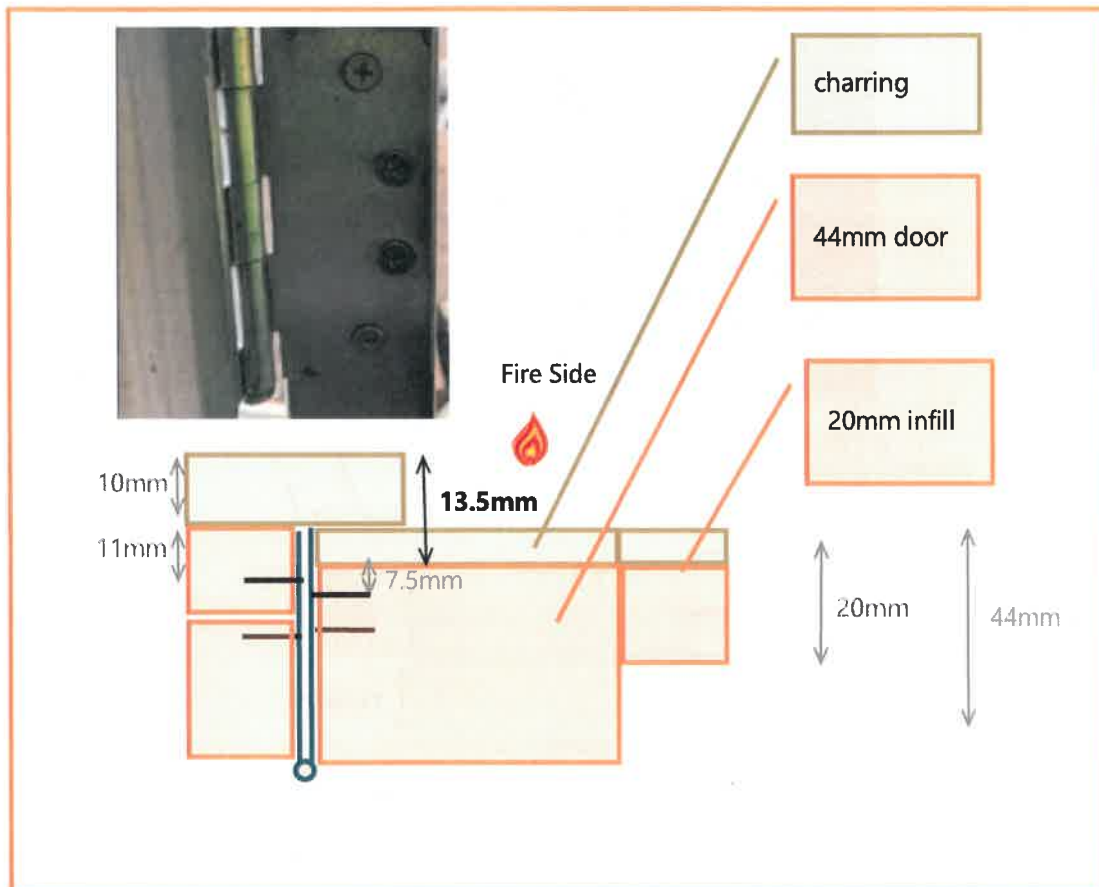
44mm thick door with 20mm infills with closest screw fixings at door 1/4 point – Fire Door Stop Side
